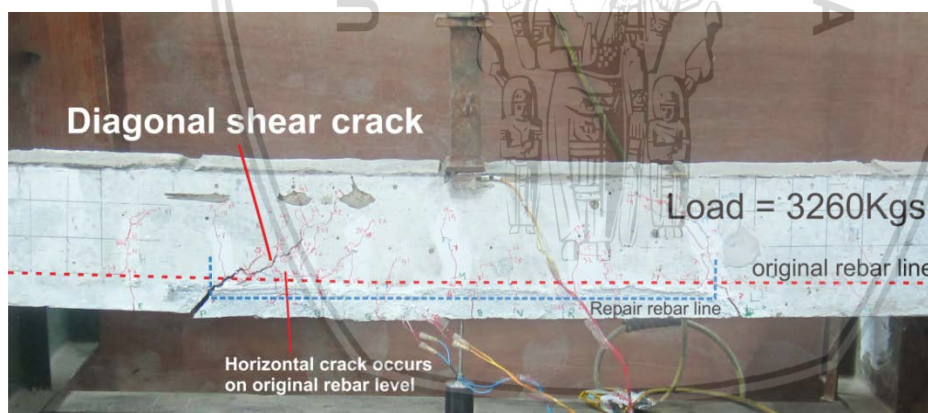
Diagonal shear crack development of S7 Yield-2 specimens
